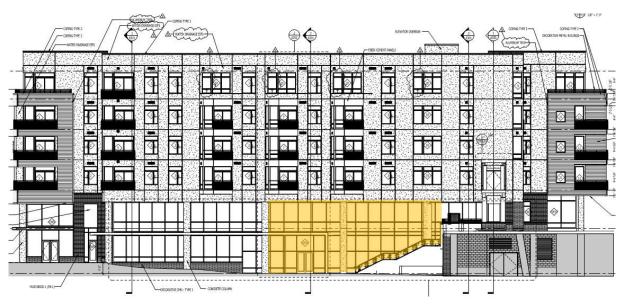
| Southwest Elevation - Lower Level Lobby
